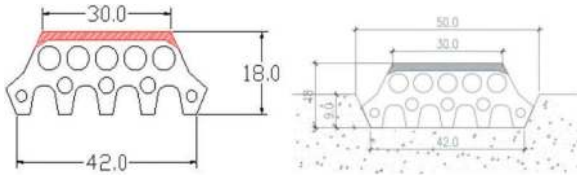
Joint waterproof of grouted mortise-tenon joint.
